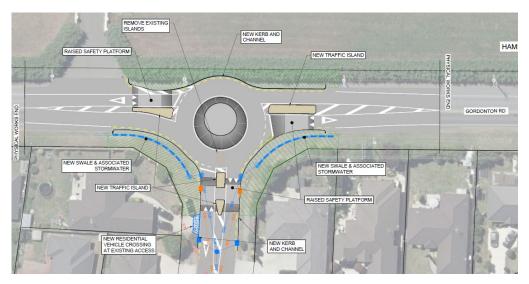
Darjon/Gordonton Intersection – General Layout Plan – Scope of Works
